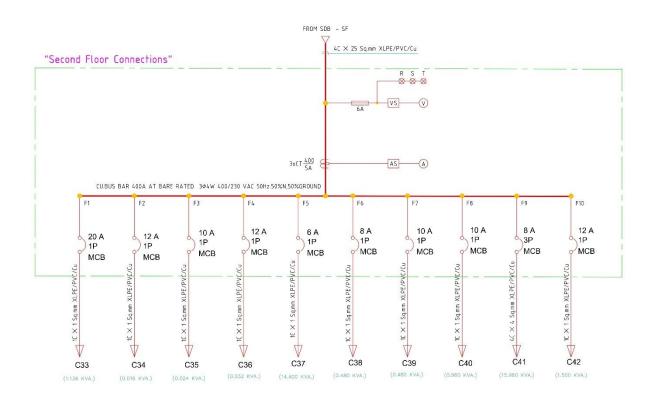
Single Line Diagram for Second Floor and Rooftop Loads
